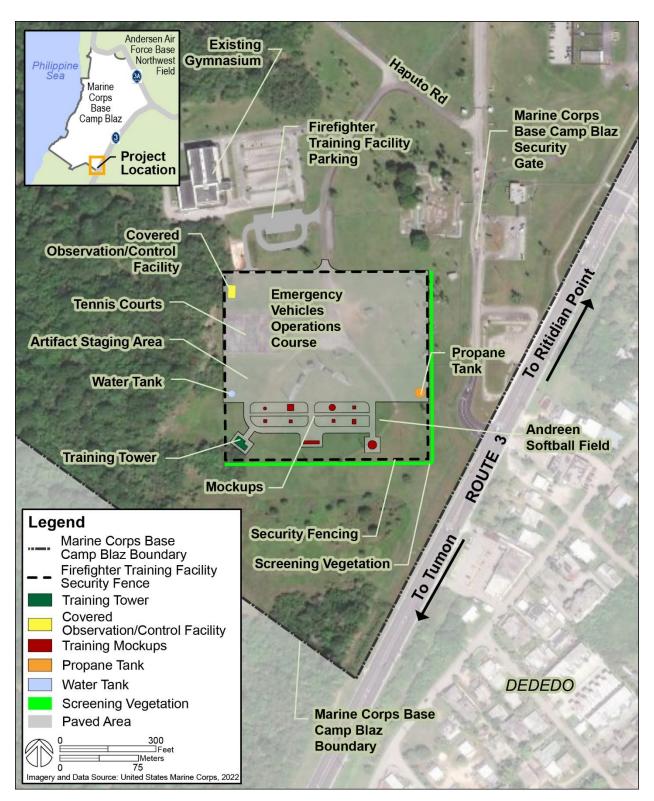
Alternative 1 (Preferred Alternative) – Conceptual Site Plan
